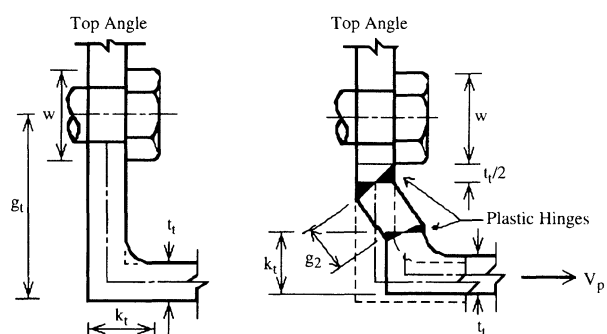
Top-angle diagram showing fillet and mechanism of failure.
